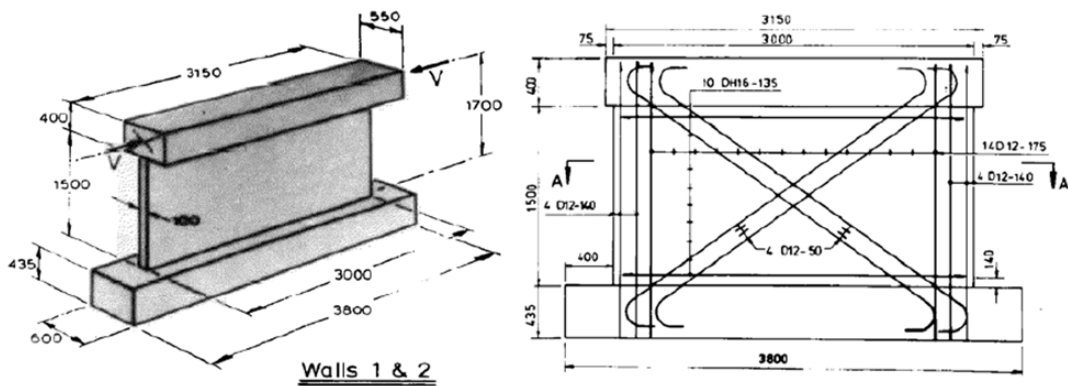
Squat wall specimen layouts (Paulay et al., 1982)
